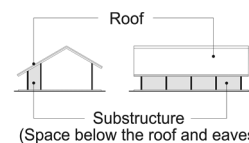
Silaban’s sketches of roof accentuation in small buildings⁸⁾
